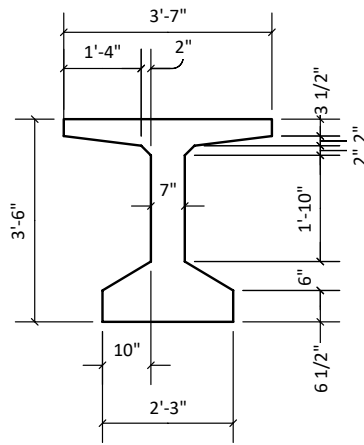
Two Span Bridge - I-Girder Cross Section
